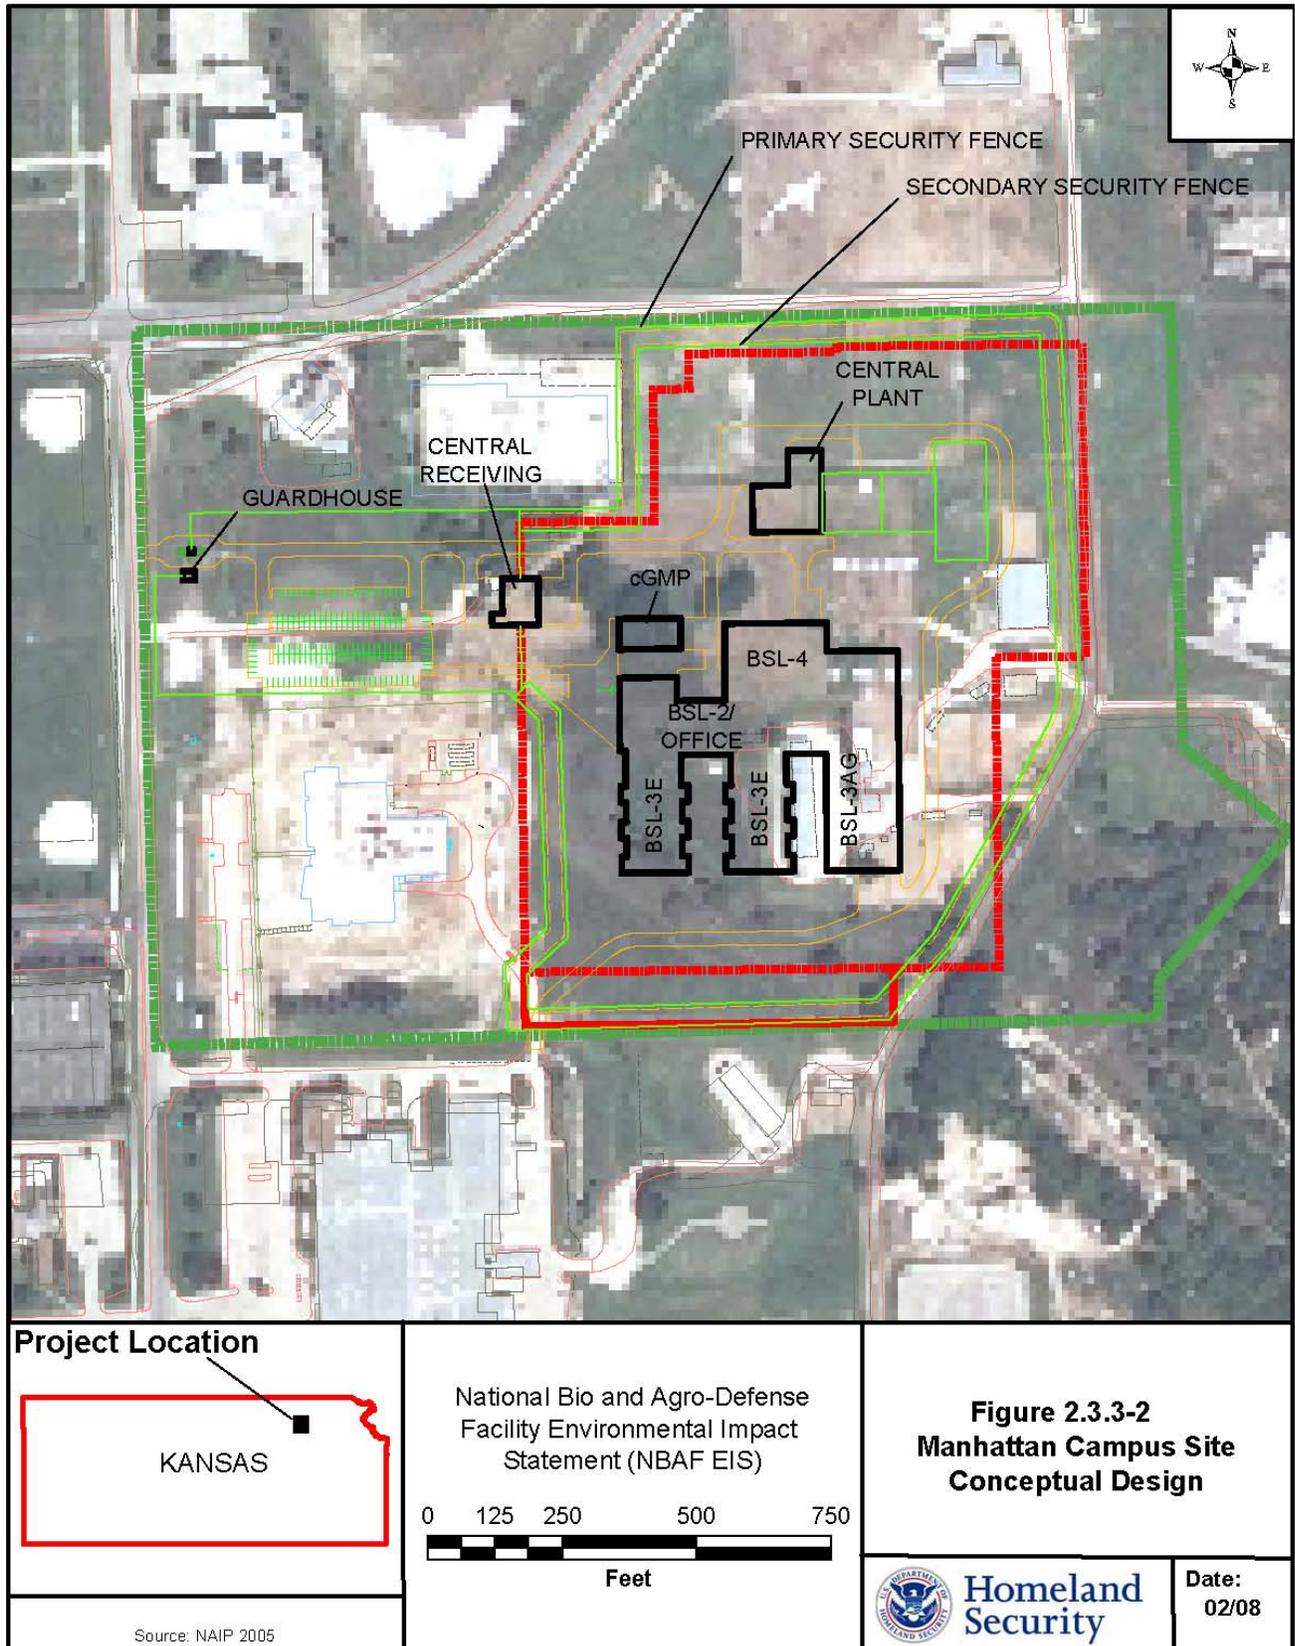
Manhattan Campus Site Conceptual Design
